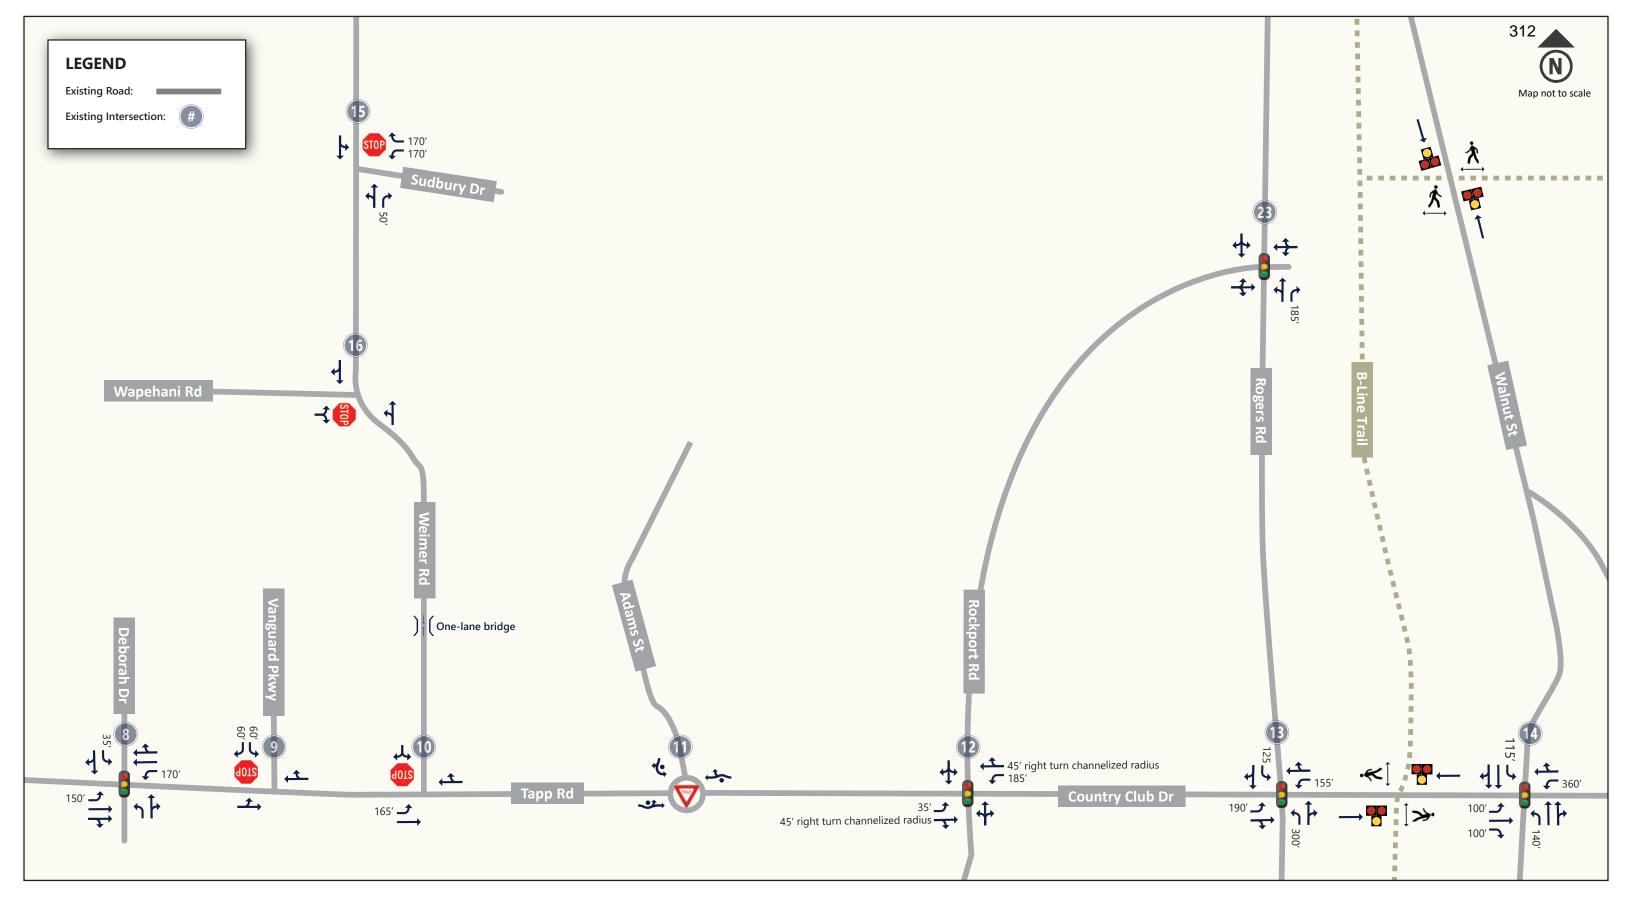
Existing Intersection Geometries: Tapp Road / Country Club Drive / Winslow Road, Weimer Road, Rockport Road, Rogers Street, and Walnut Street
